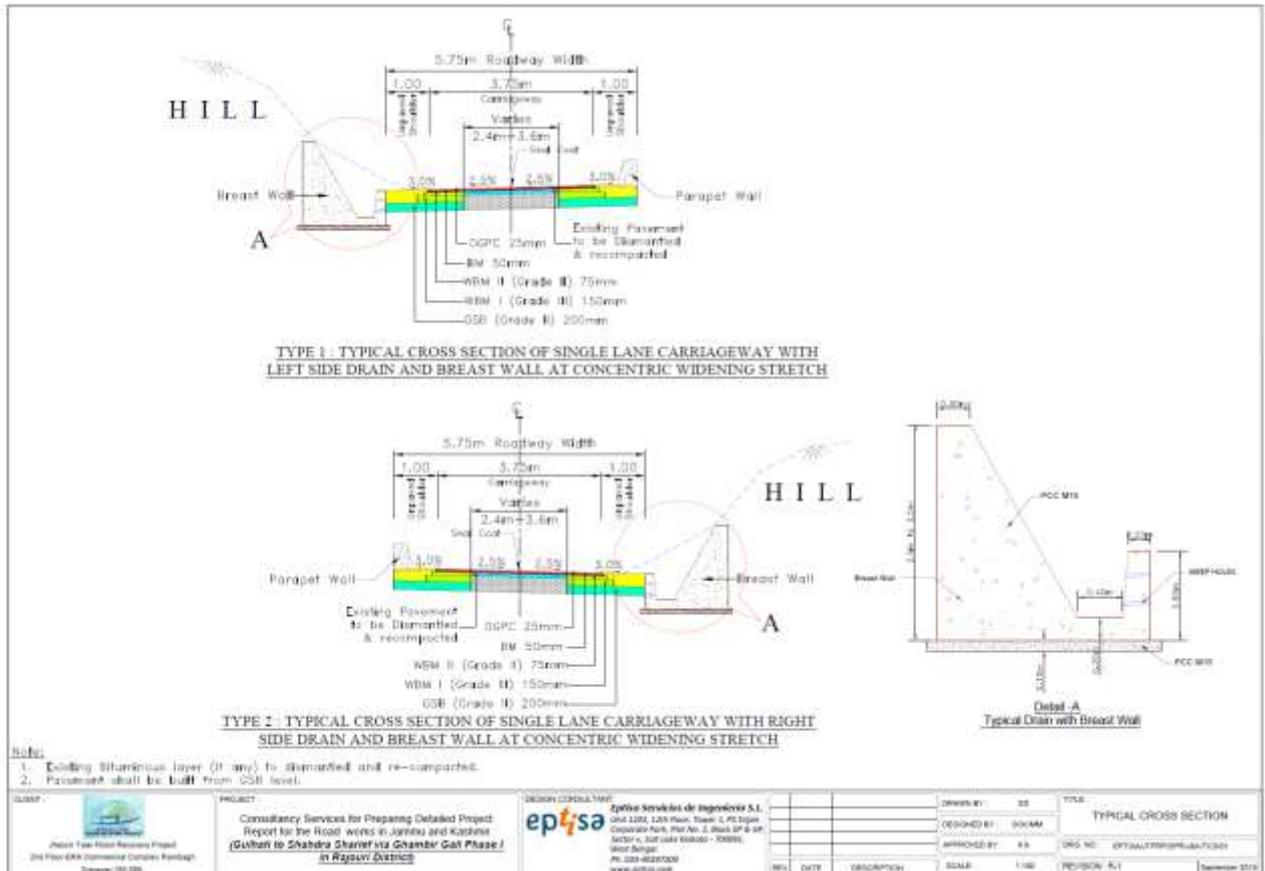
Typical Cross-Section of single lane carriageway width (Right/Left side drains) and Breastwall at concentric widening Section
